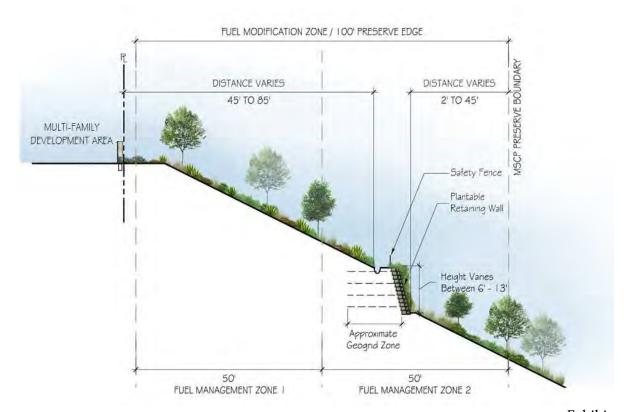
Perimeter Slope & Plantable Retaining Walls at Main Street
